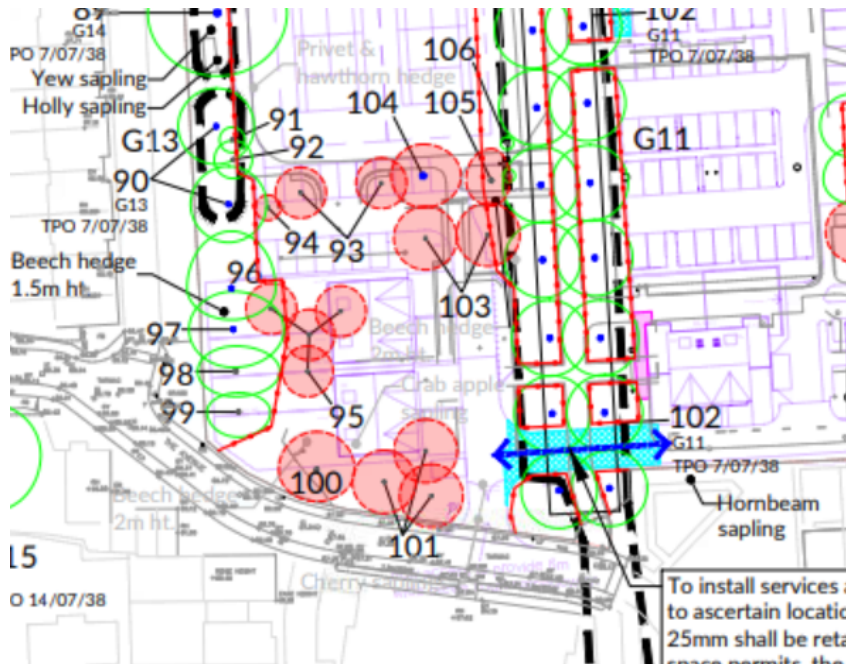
Extract from Tree Protection Plan Ref. 1642-KC-XX-YTREE-TPP01 REV F demonstrating the location of Trees to be removed at 100, 101 & 103.
